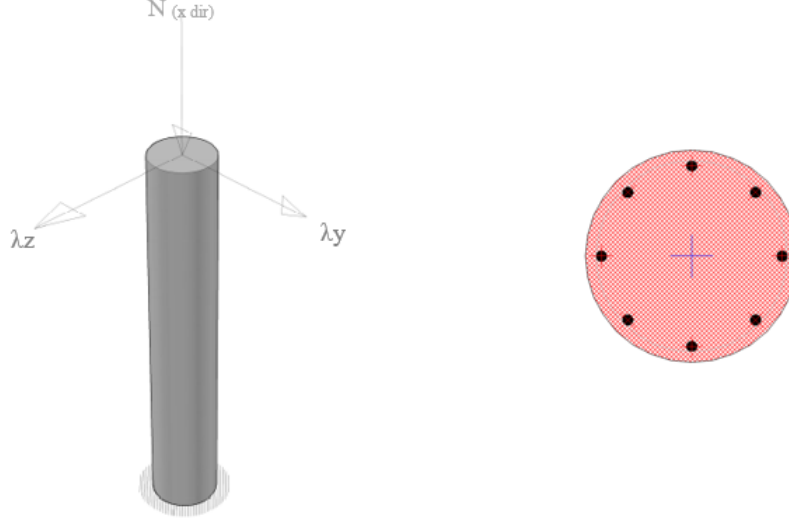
Loading and cross section of 3D reinforced concrete case study
